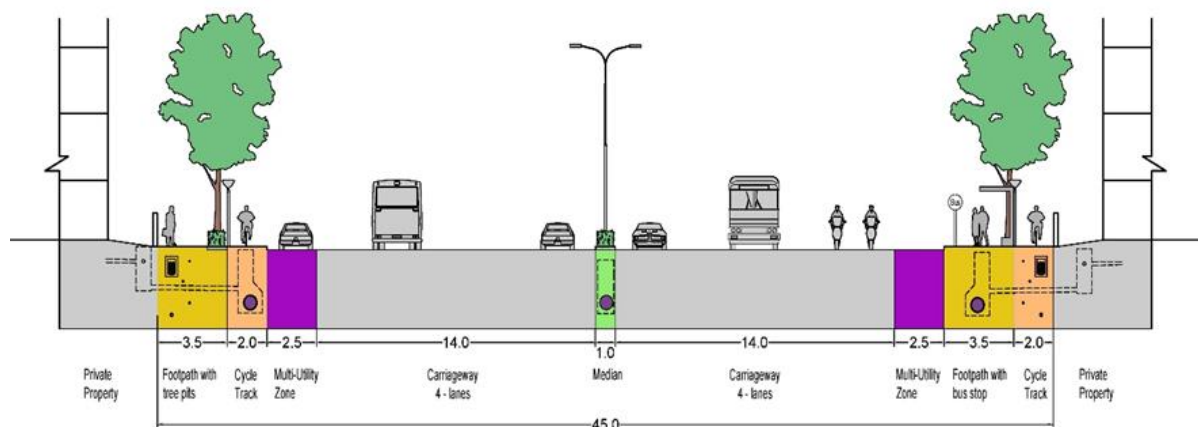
TYPICAL SECTION OF 45M WIDE ROAD
